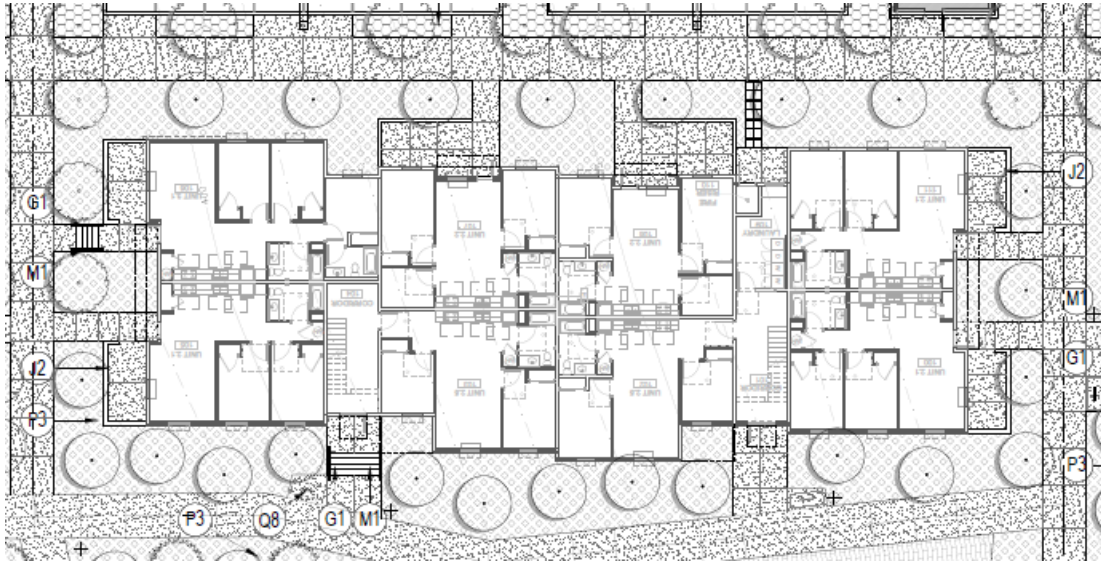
Type B Building Landscape Plan Detail (Sheet L1.02)
